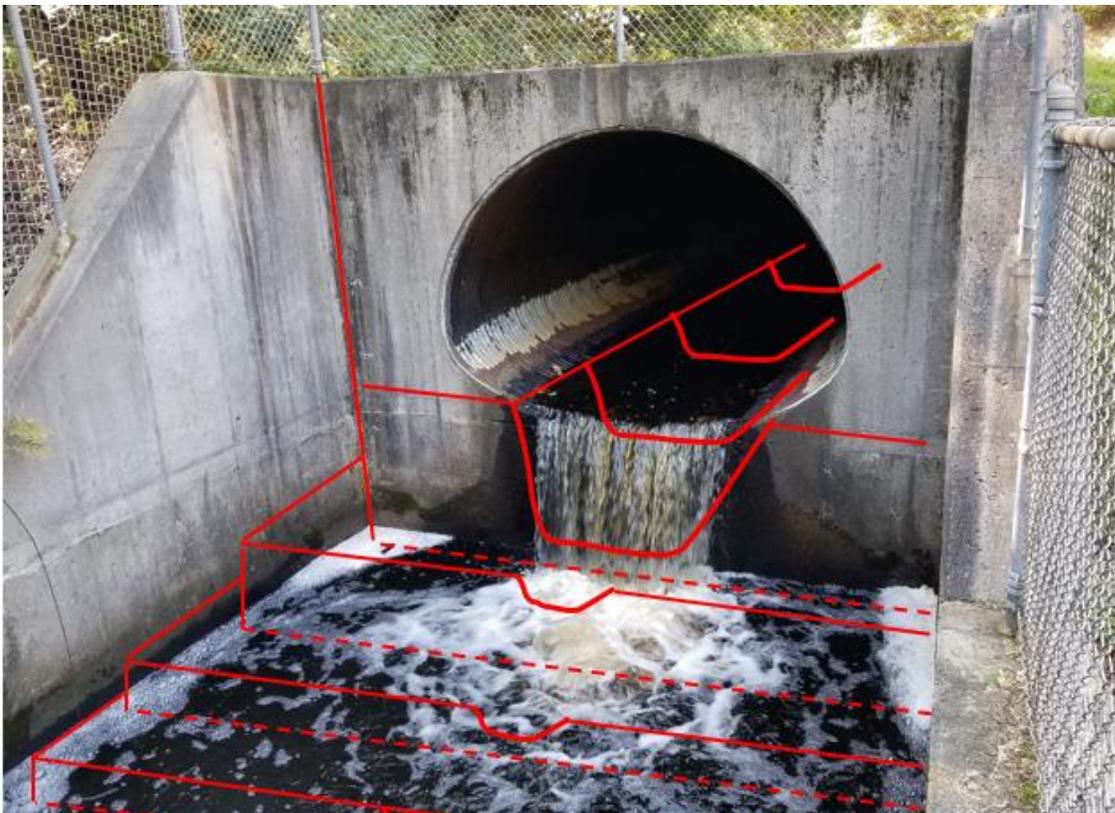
Alternative 6, View Shows the “Keyhole” Culvert exit
